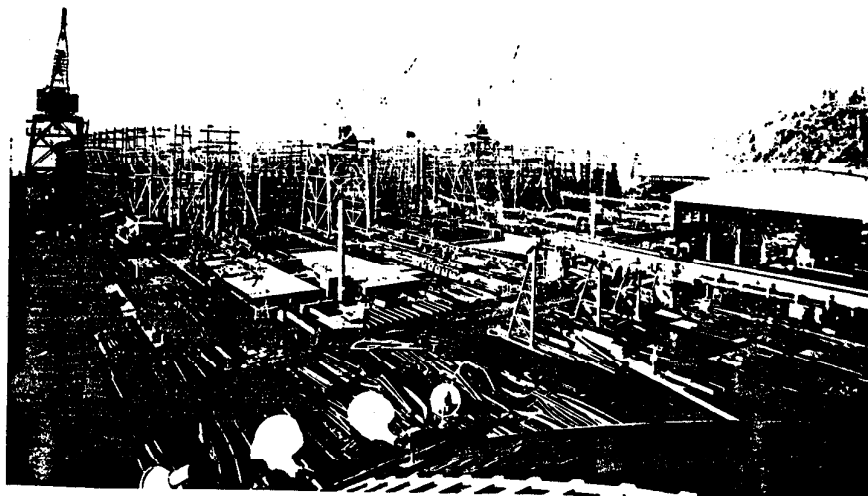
Looking north from roof of Steel Shop "B" with Shipways and stagings and Steel Shop "A" at right center.
